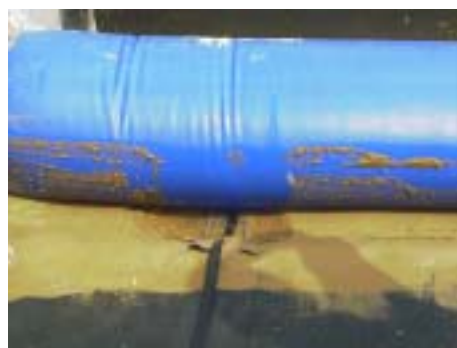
Piping Failure at Strap Locations in Trial 5
